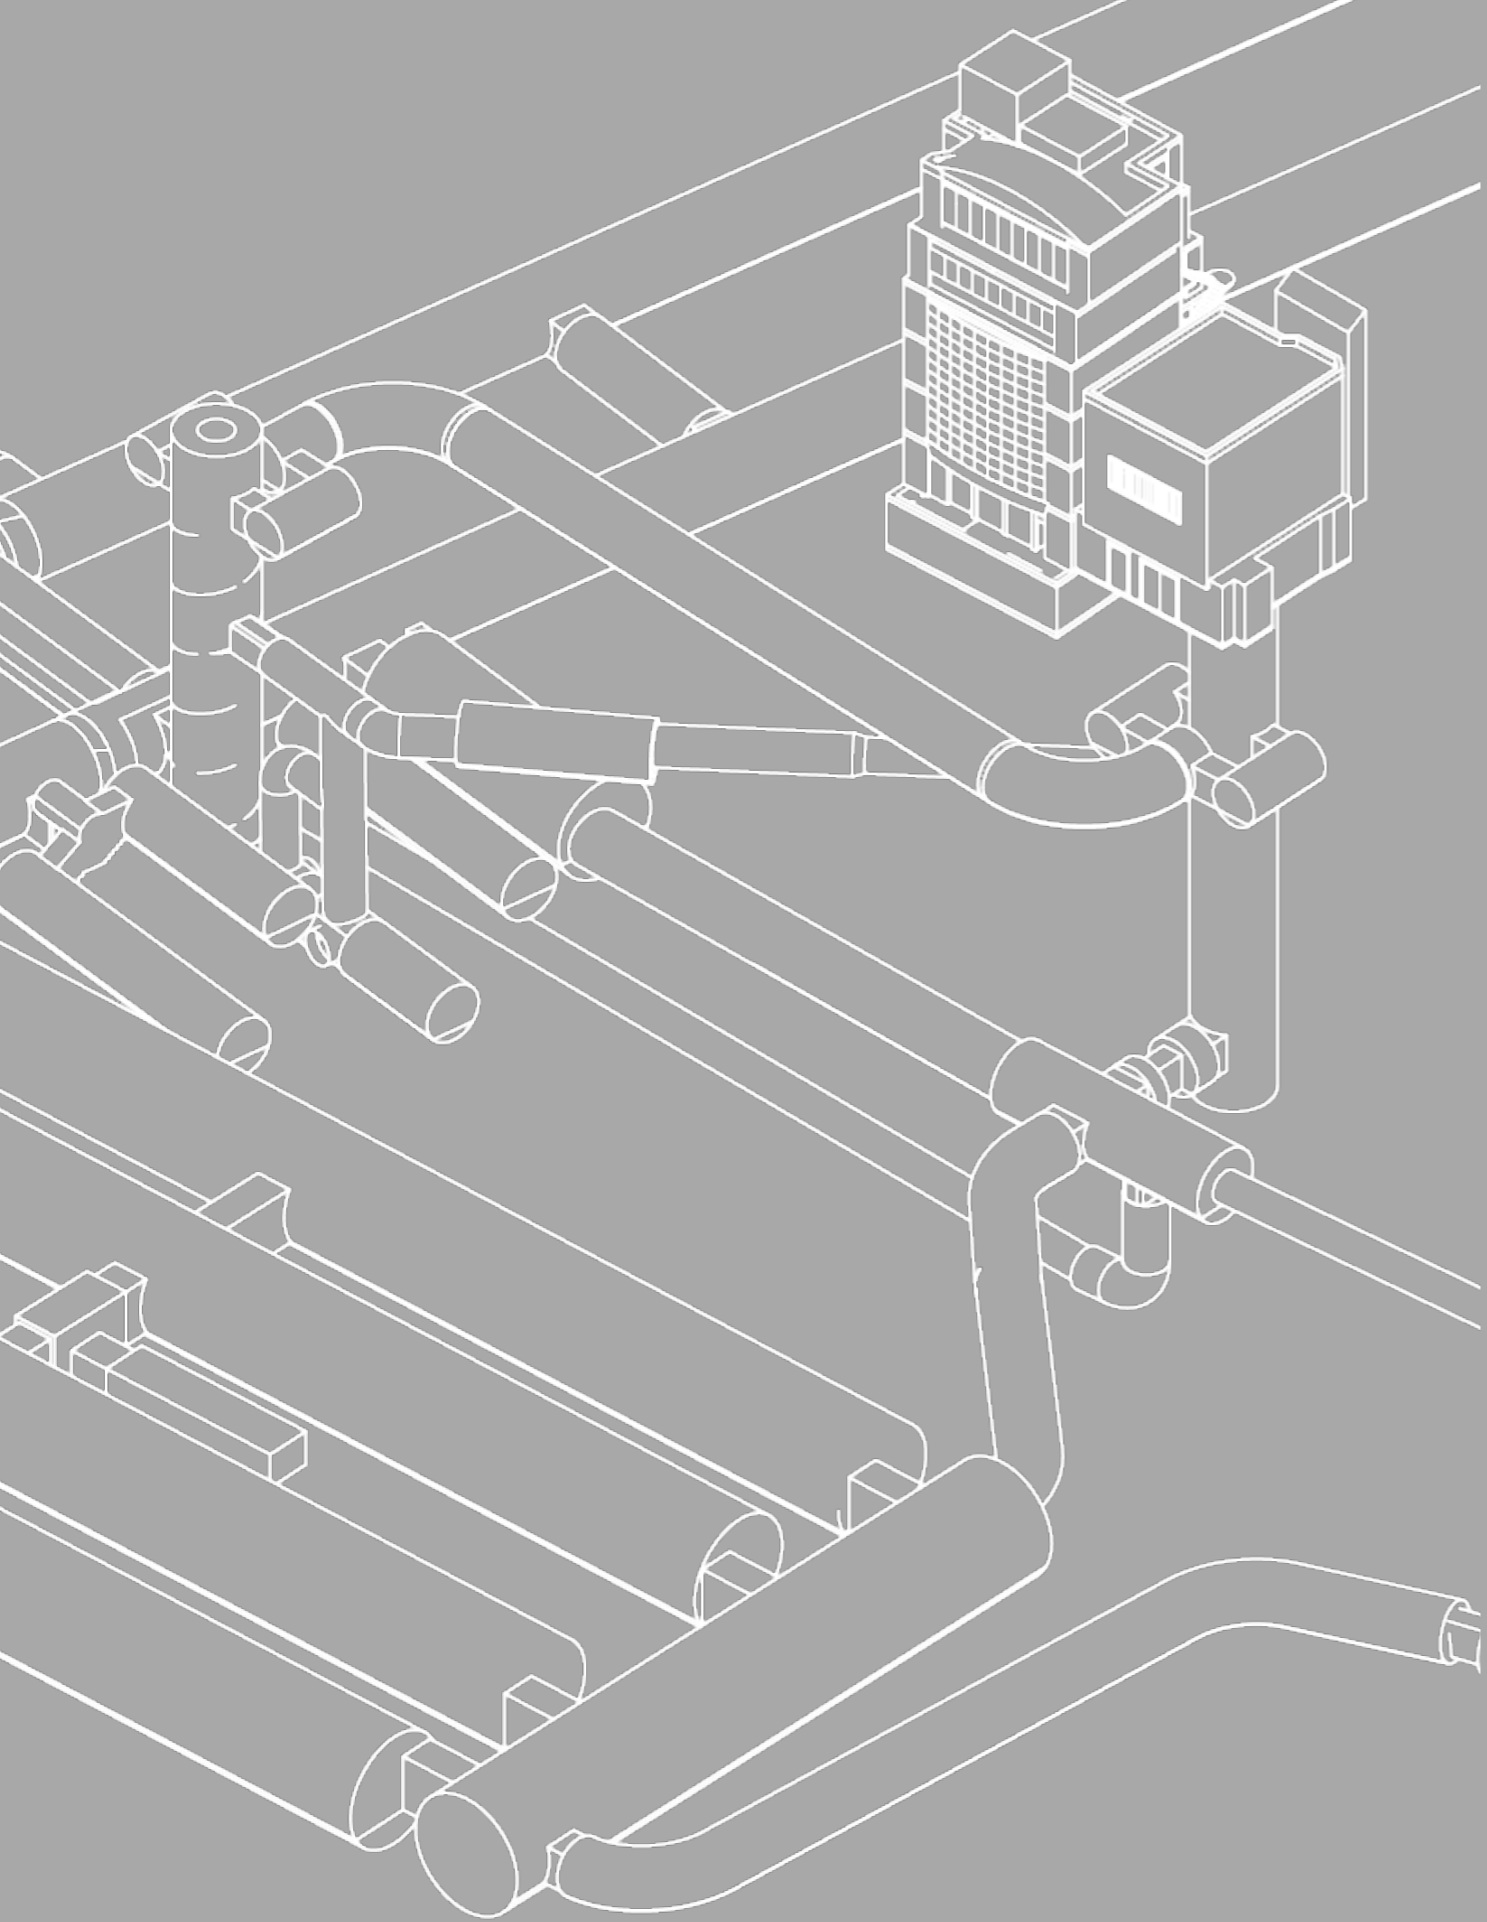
Will be converted and extended to provide fireman's lift access to the underground space
